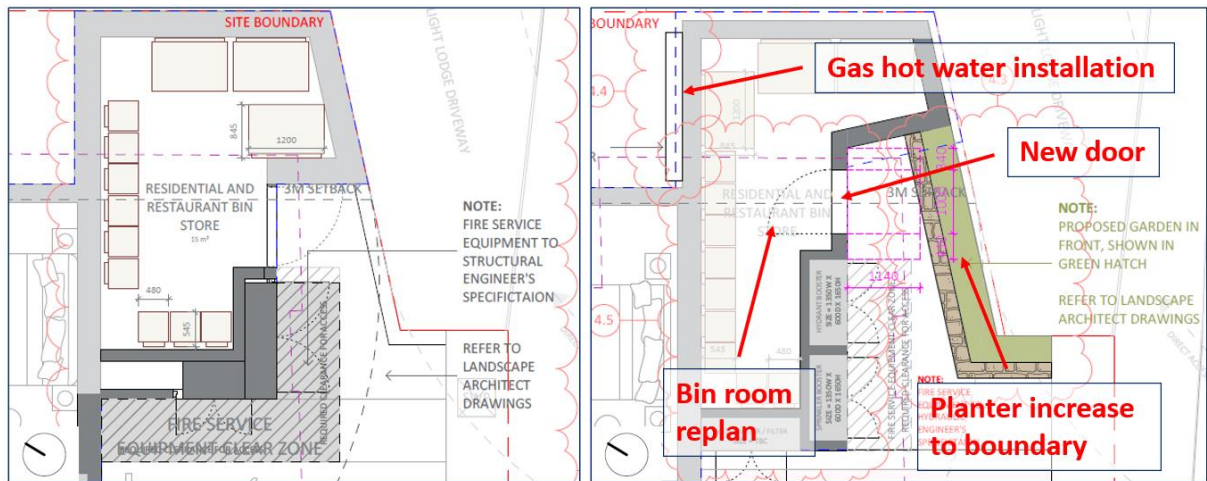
| Approved (left) and proposed (right) Level 4 plan (Source: Department's Stamped Plans 2022 and Applicant's SEE 2023)
